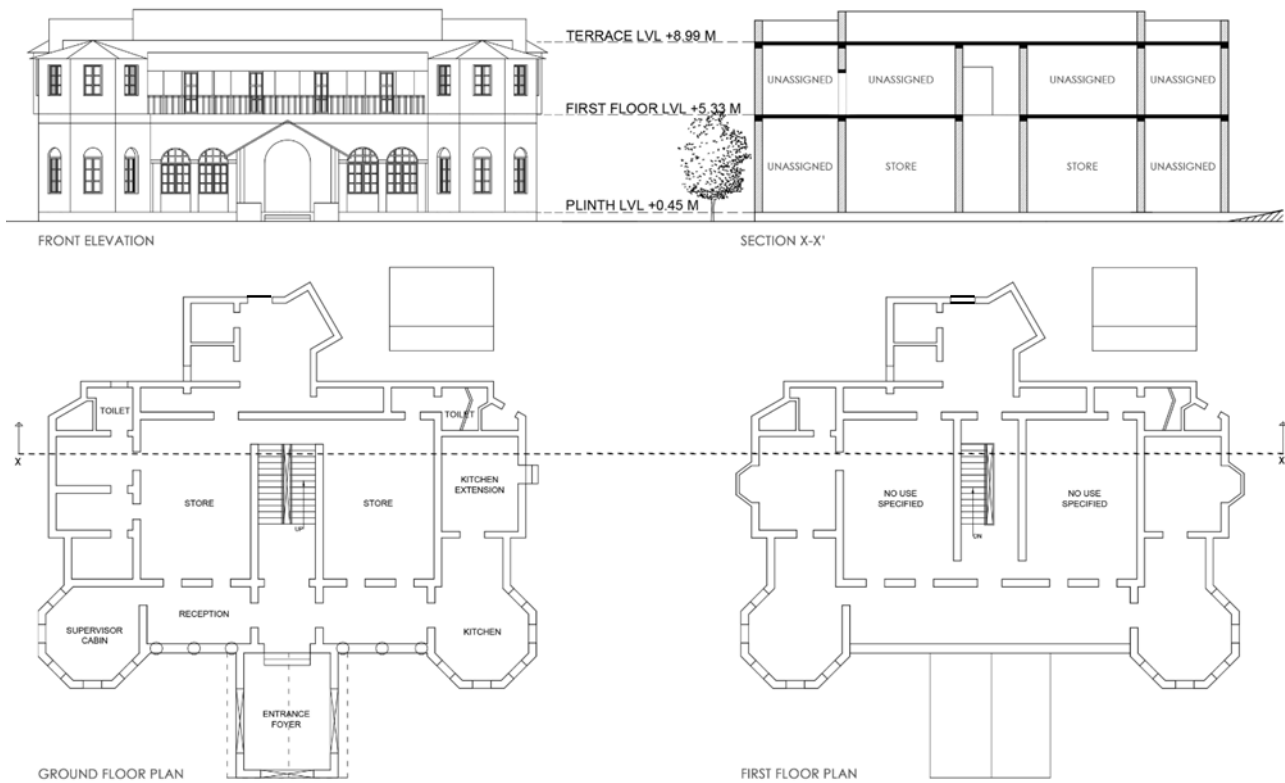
Architectural Drawings - Elevation, Section & Plans (Source: Author).
